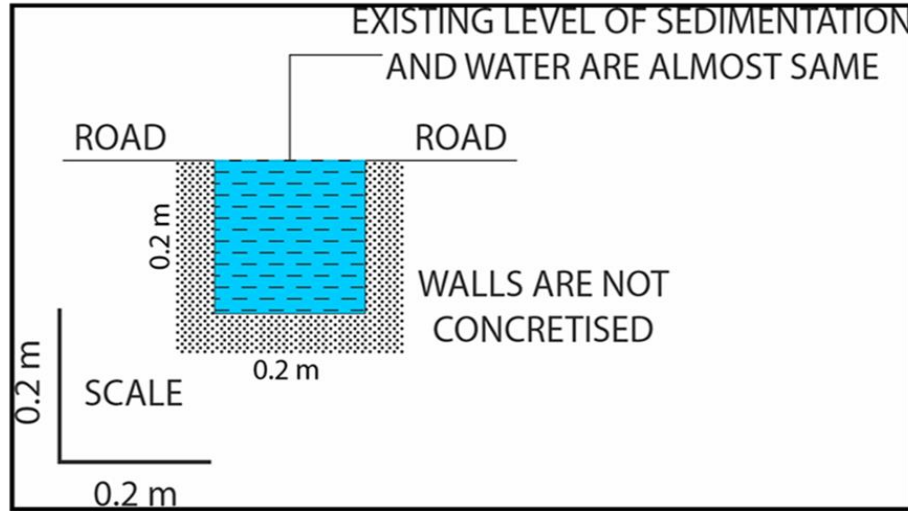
Cross Section of a Kutchha Drain (Earthen Drain)
